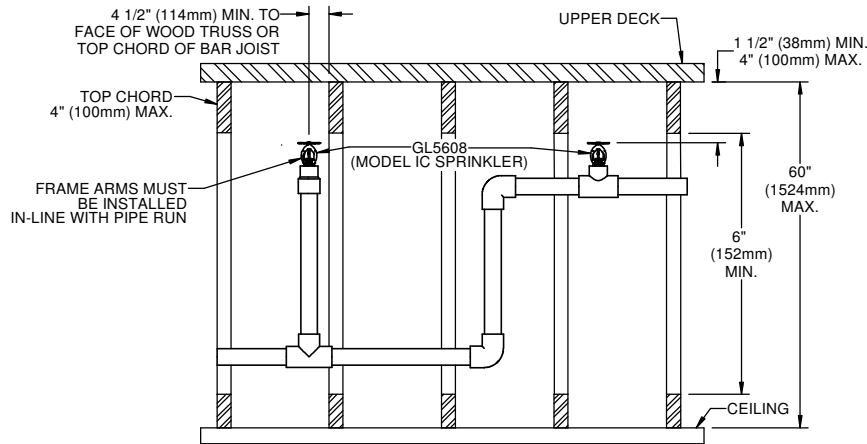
STEEL PIPE UNOBSTRUCTED WOOD TRUSS OR NON-COMBUSTIBLE BAR JOIST CONSTRUCTION
